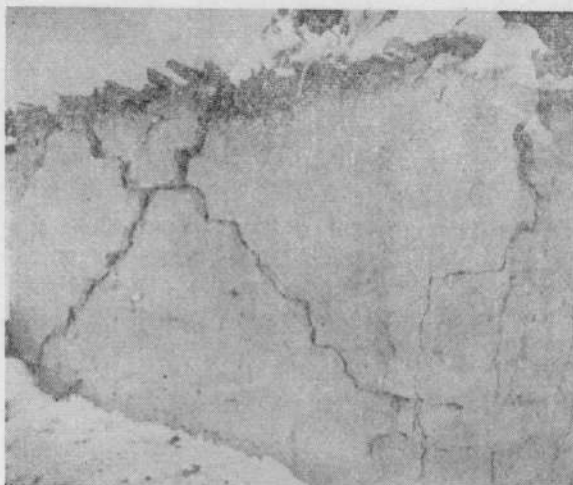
Diagonal cracks along mortar joints in mud brick house at Chango village.
